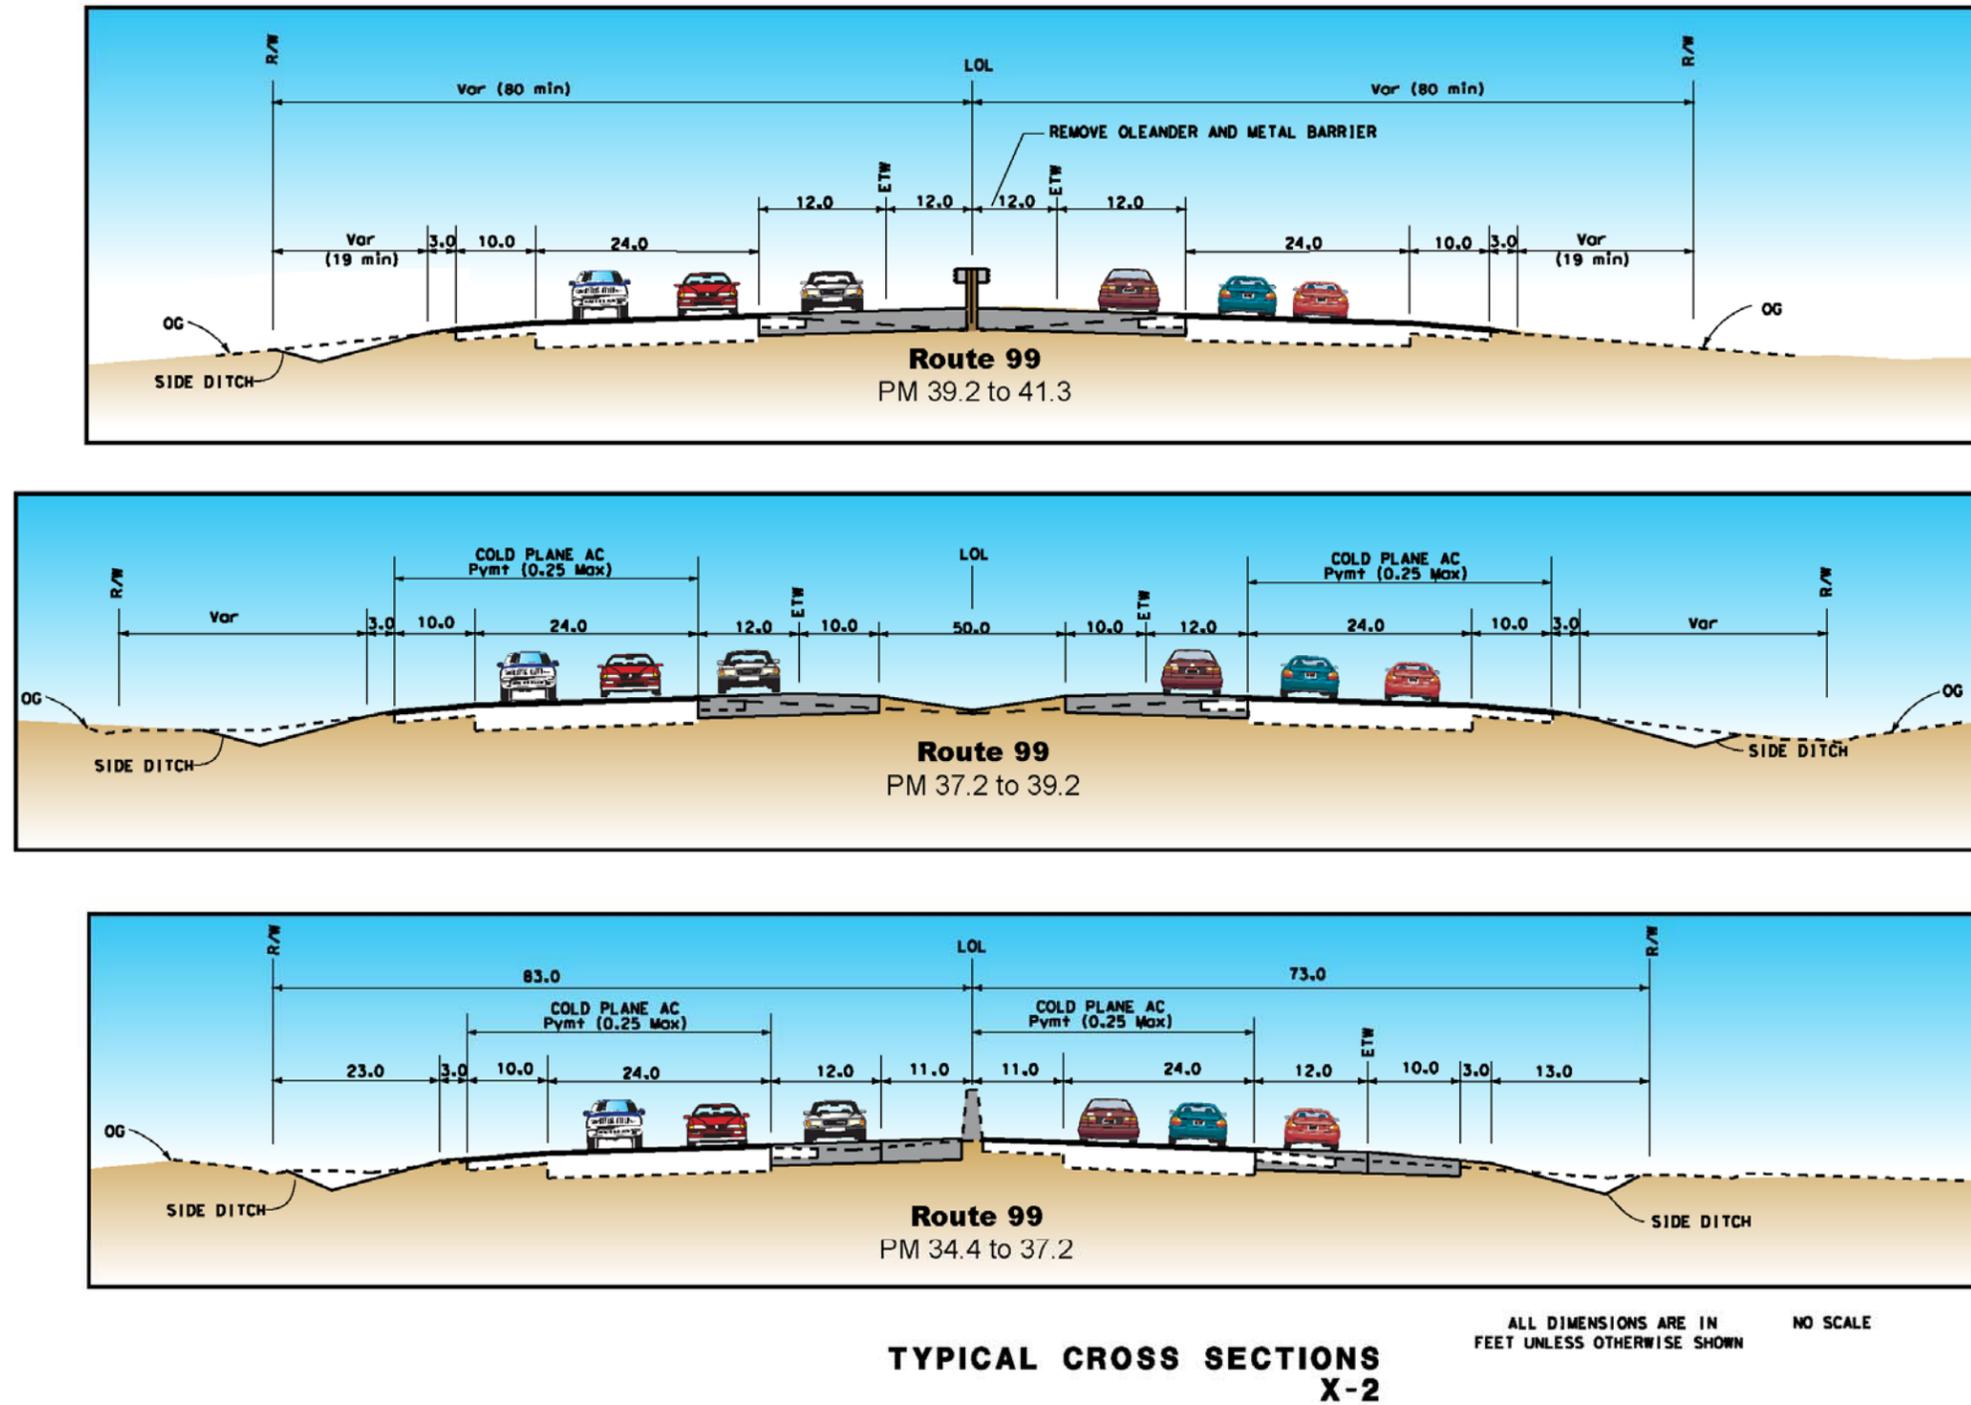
Typical Cross Sections for Post Miles 34.4 to 41.3
